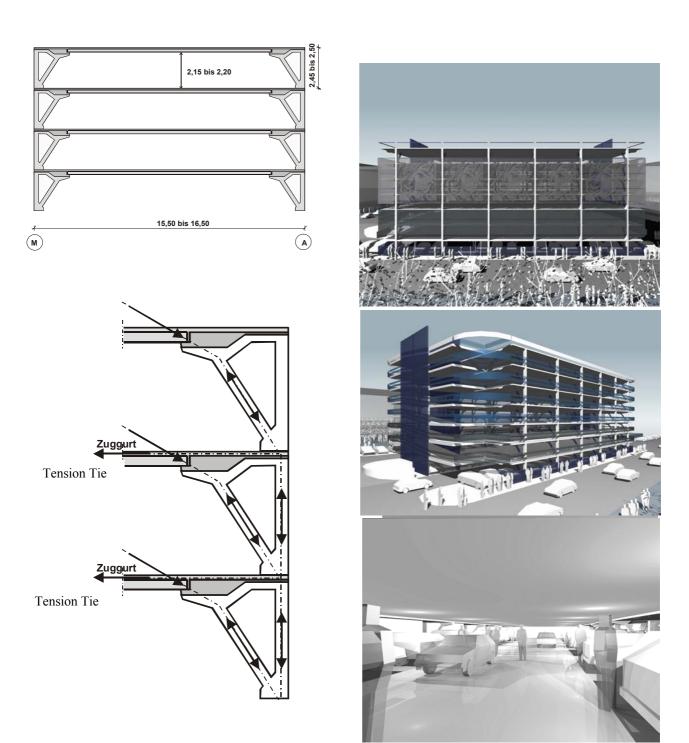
Parking Structure II: structural detailing and architectural view [7]
